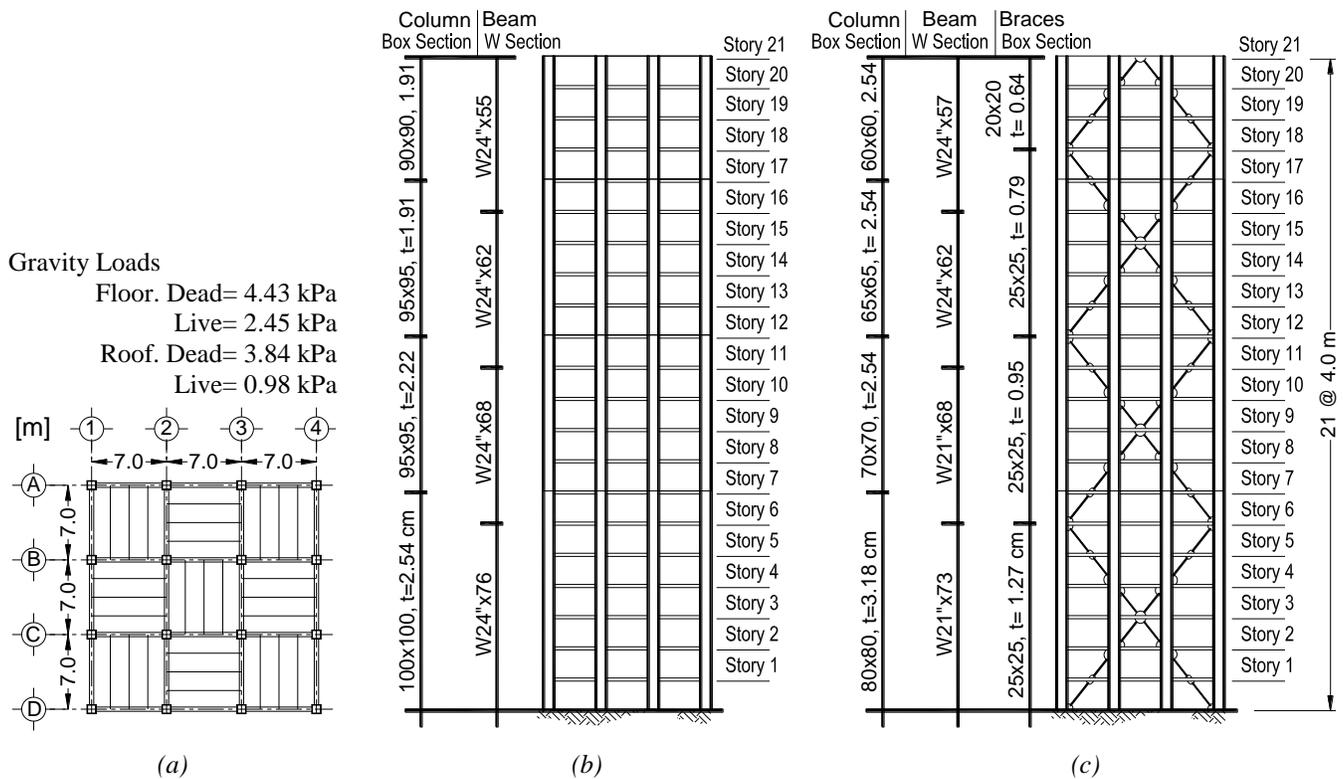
Analyzed buildings, (a) Plan view, (b) Moment-resisting steel frame (MRF), (c) Concentrically braced steel frame (CBF)
